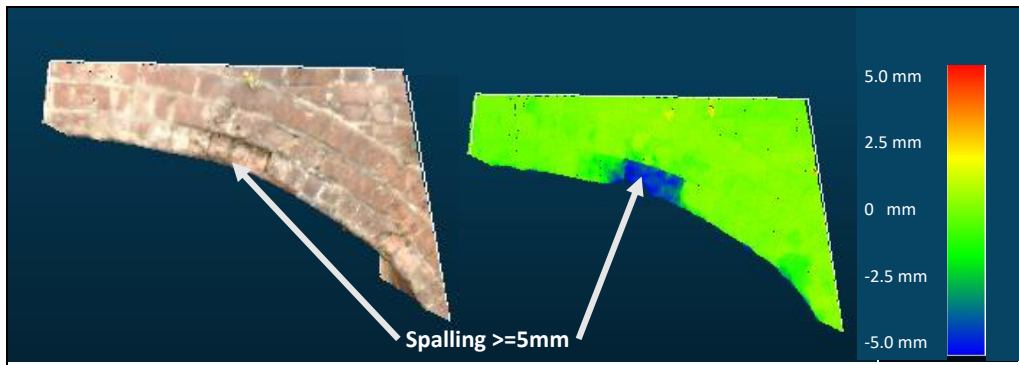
Detection of spalling ≥ 5 mm.
